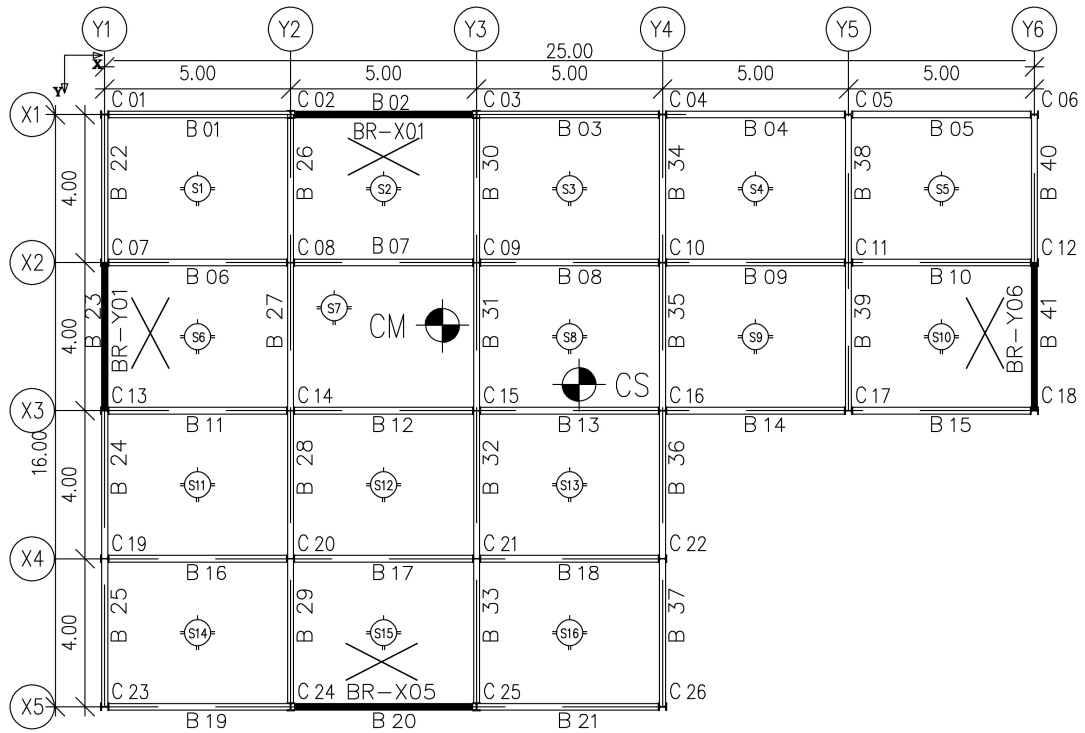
Typical layout of the 5-story torsionally stiff steel building.
